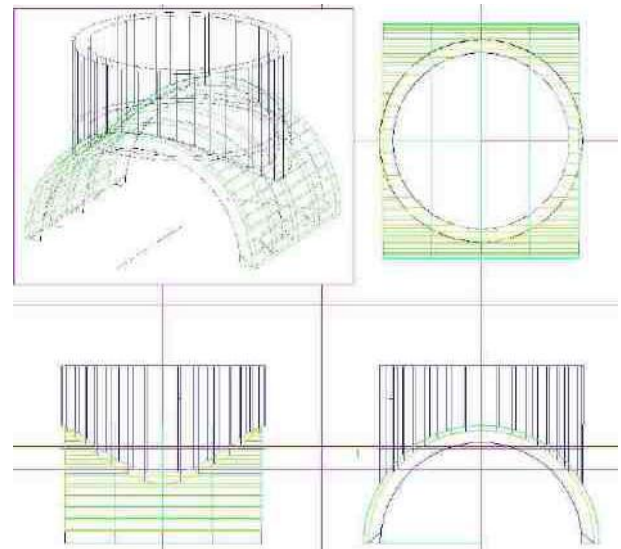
Reinforced-concrete system supporting the skylight – tambourine and half-cylindrical shell, A3.
